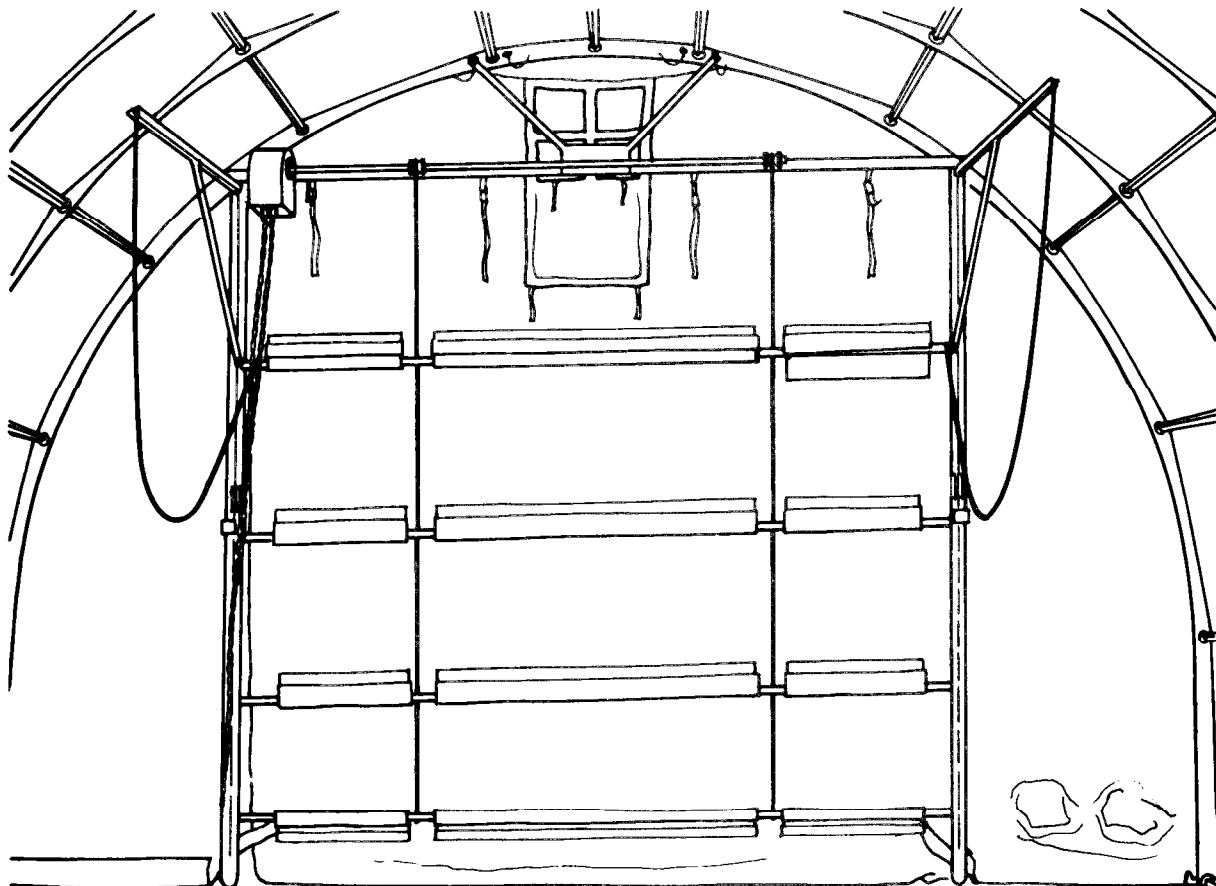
Attaching door spars to doorposts (Sheet 1 of 2).
